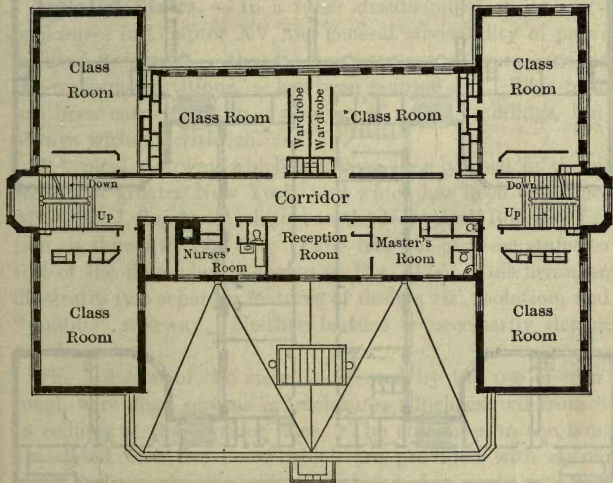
Second Floor Plan, Lyman District School, East Boston.
